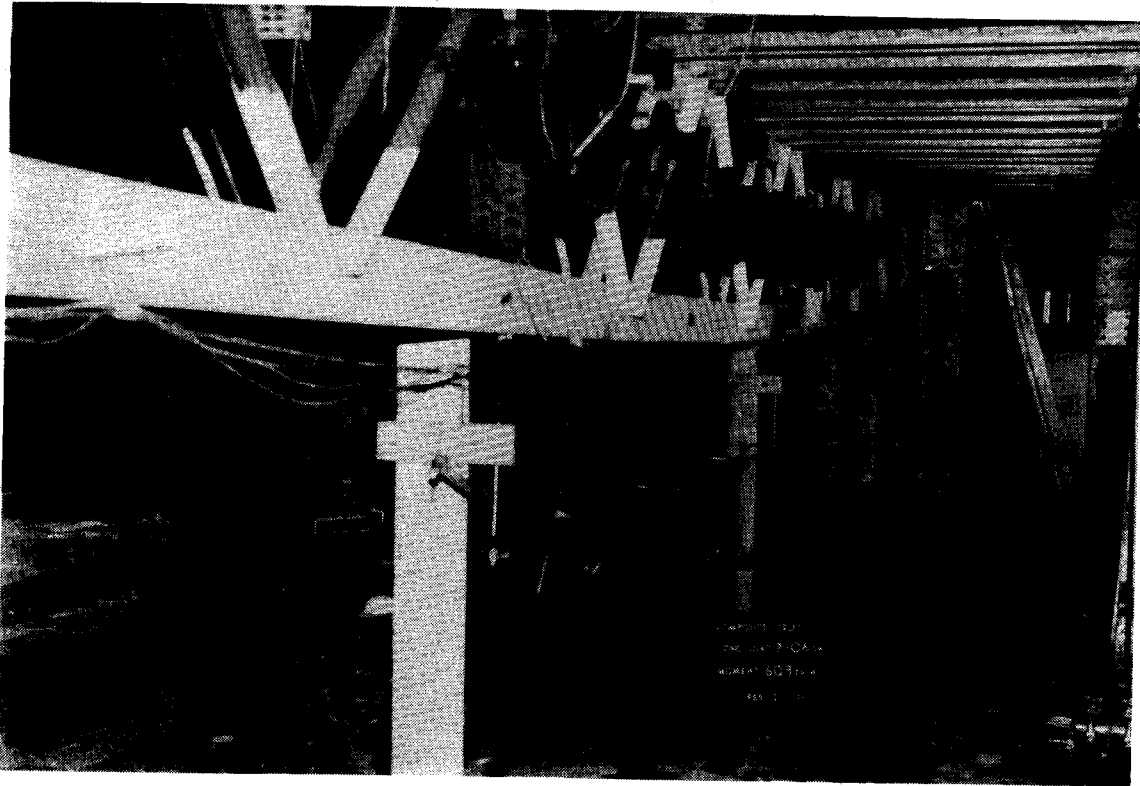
Deformed truss at 0.99 of maximum load - truss 1
